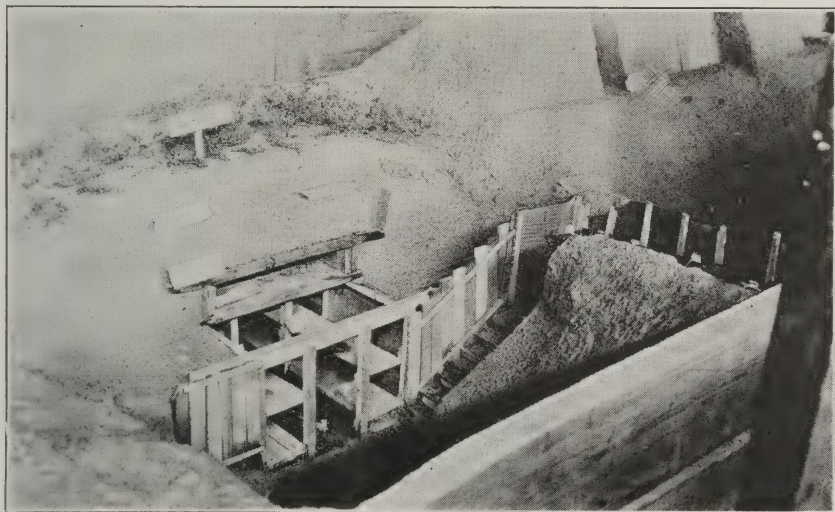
Cut and Cover Shelter. Air space construction. Cover: 6 inches earth, 2 feet concrete, corrugated iron, steel rails, 15 inches air space, heavy square timber.
